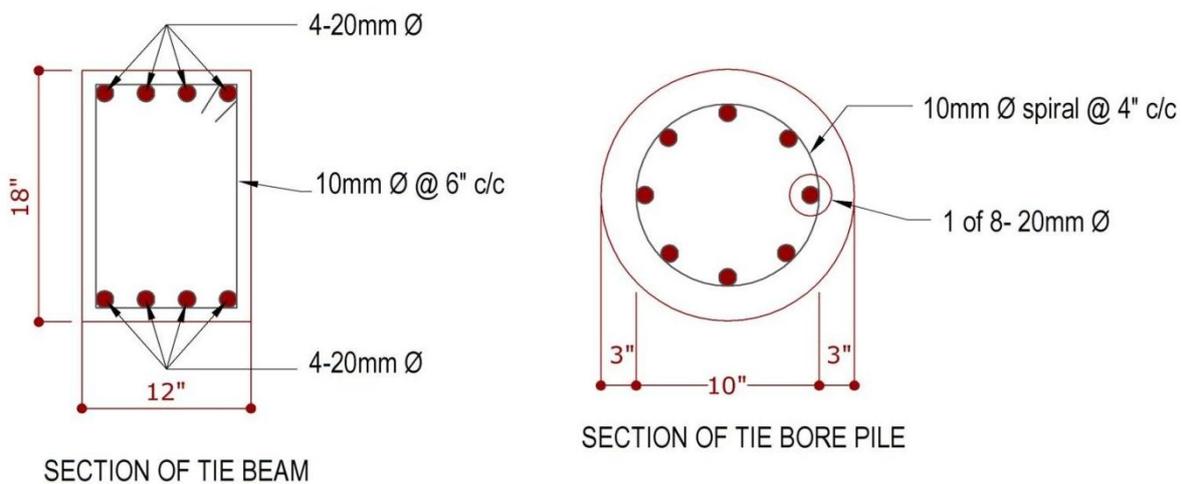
Cross Section of Bored Pile and Tie Beam Showing Reinforcement
